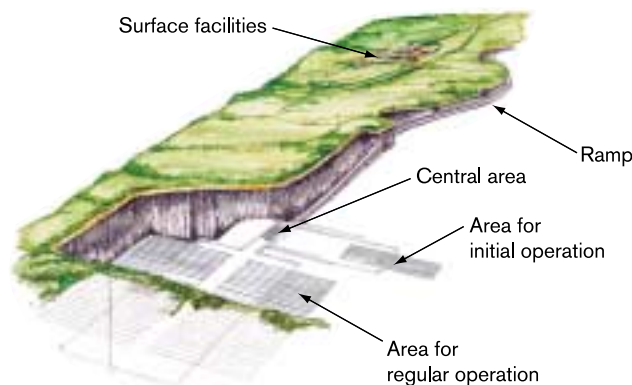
Schematic layout of the deep repository with a ramp from the above-ground facilities to the below-ground facilities.
